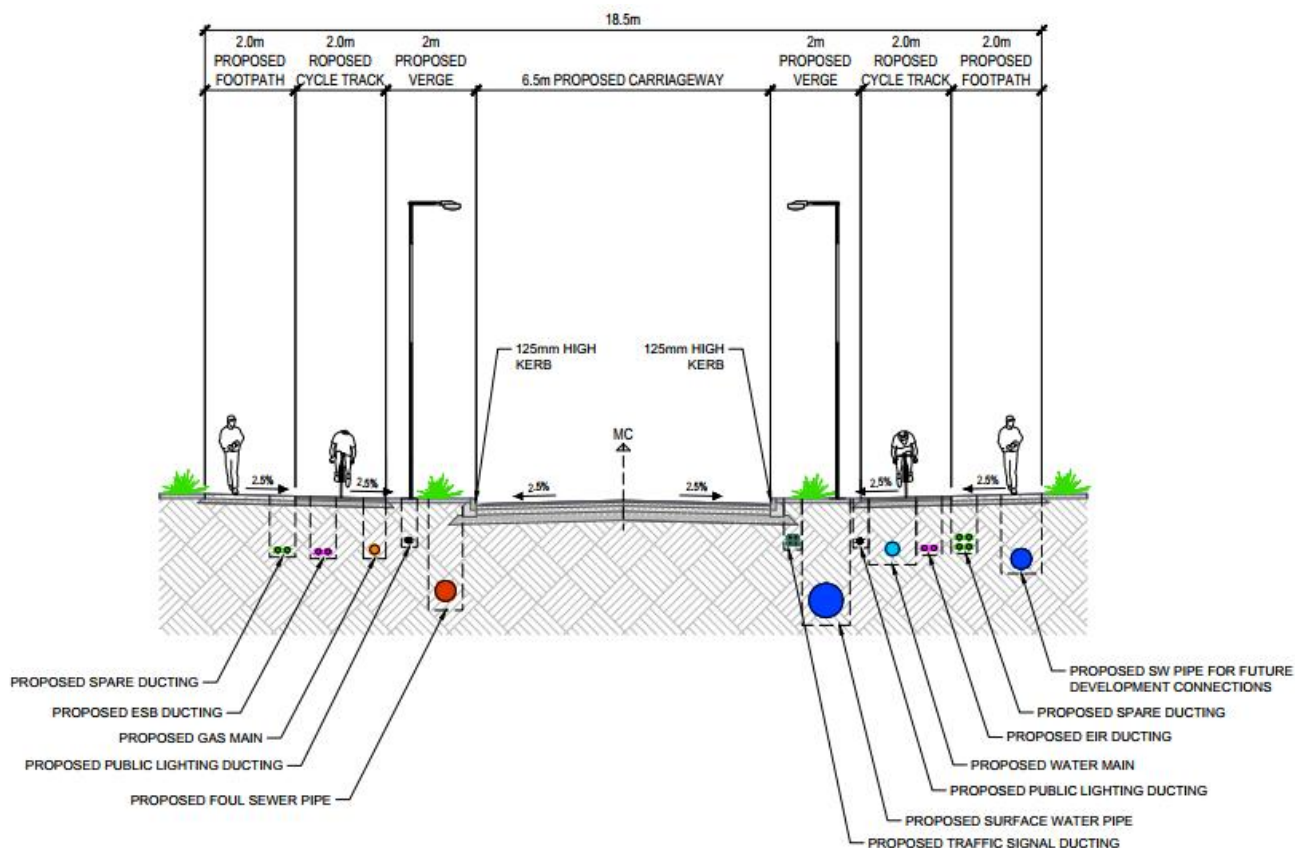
Typical Cross-Section of Northern Services Corridor Link Road
